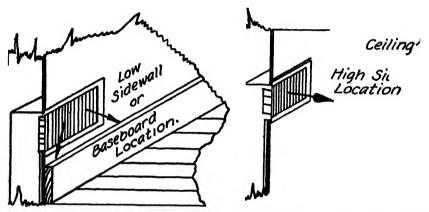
RECOMMENDED TYPE OF BASE-BOARD AND LOW SIDEWALL REGISTERS^a
